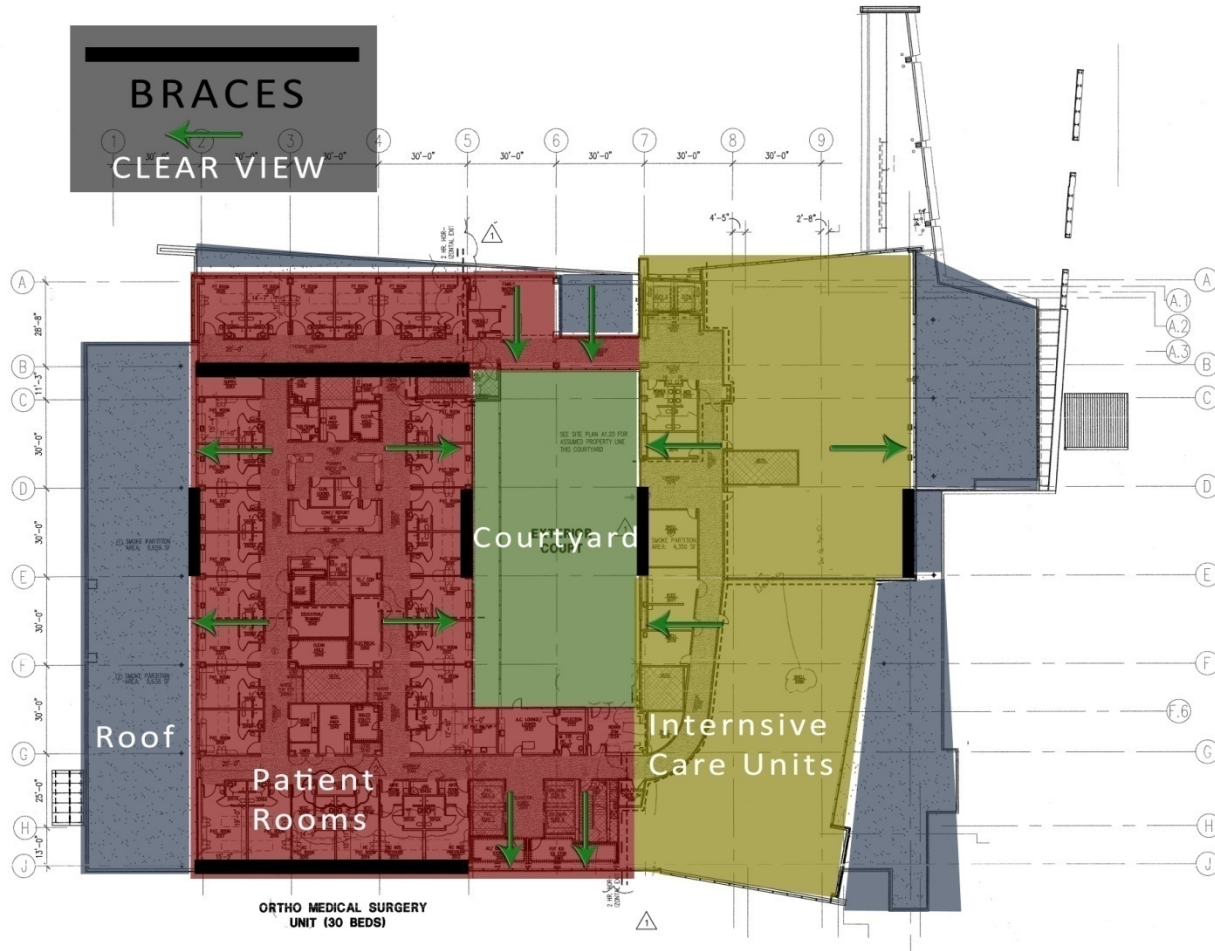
Architectural plan of level 2 showing where the new clear views to the outside exist.
